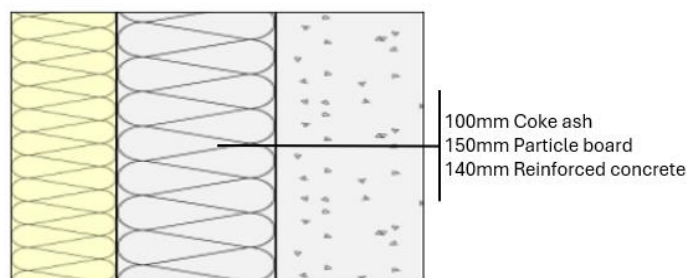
Existing roof at Byalagsgatan 8 (Laven and Strandberg, 2019, Cecilia Björk, 2021)
